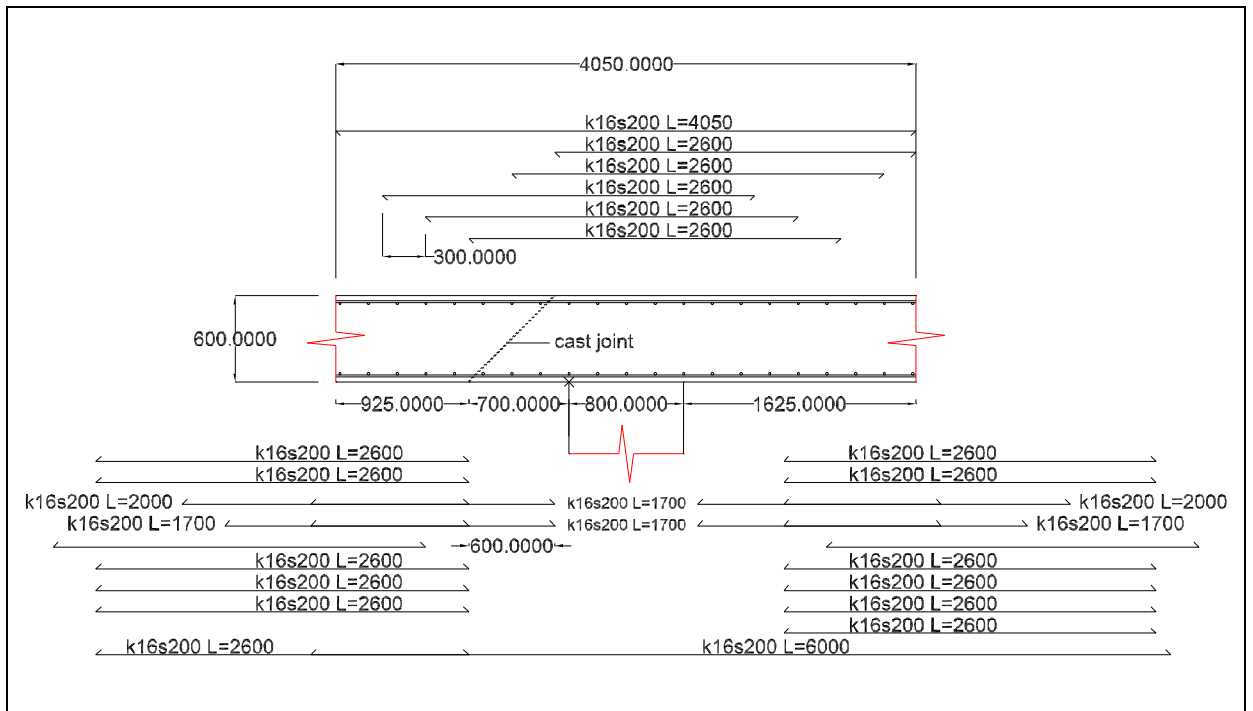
The dimensions and rebar layout of the studied slab (inspired by a quay structure from Gothenburg harbour); all dimensions are in mm.
